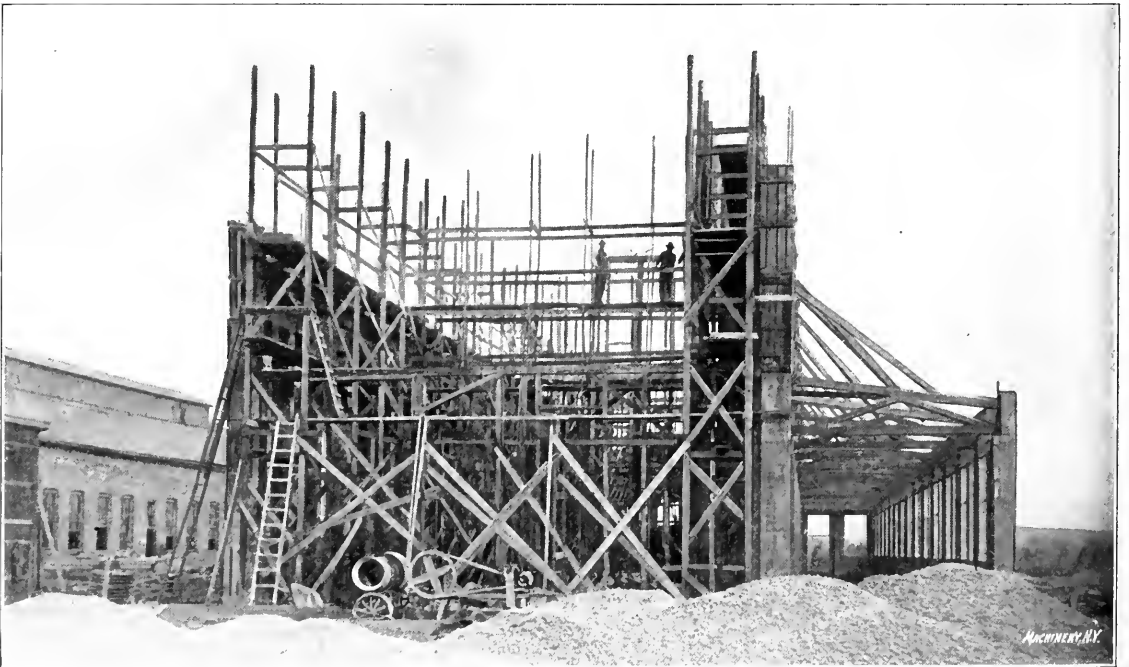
Building the Concrete Walls, showing the Wooden Molds in place on the Upper Half of Wall.
